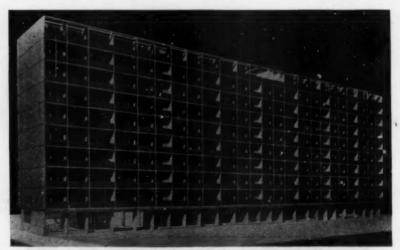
Residential Flats, Berlin: Front Elevation.
